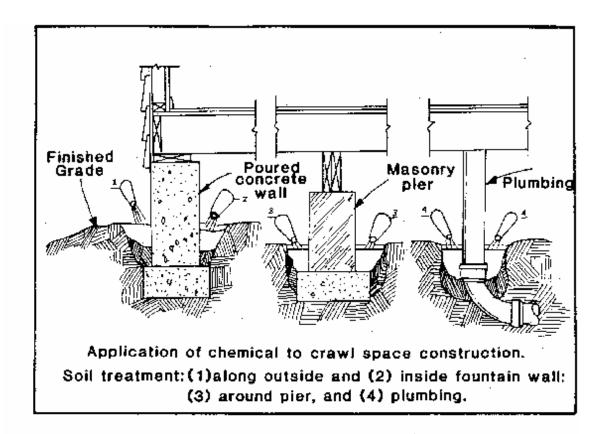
Chemical Application to Crawl-Space Construction. (Soil treatment 1)along the outside, (2) inside the foundation wall, (3) around a pier, and (4) around plumbing.)
